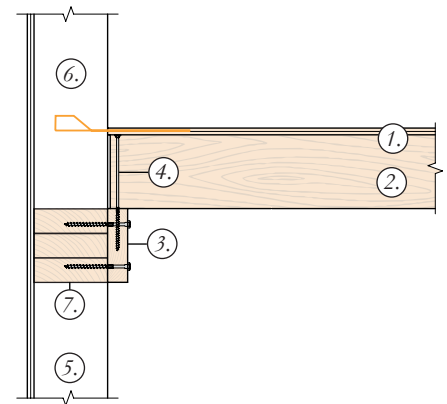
NLT Support at Balloon-Framed Wood Shear Wall
